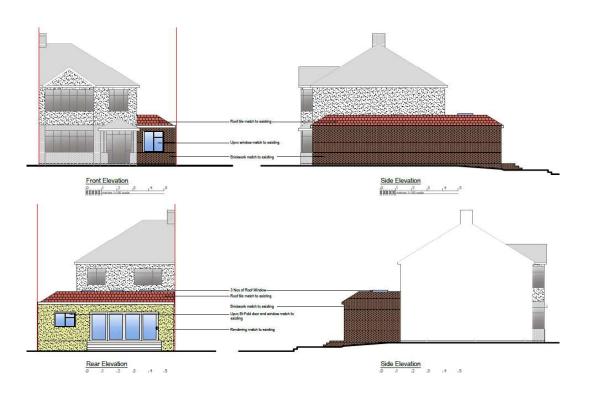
Existing Elevations (please note – larger version of plan can be found in the Committee Plan Pack)
